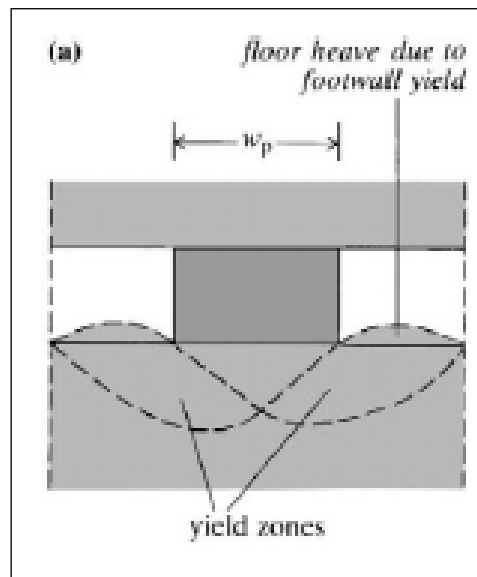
Pillar punching and footwall heave (Brady & Brown, 2006)
